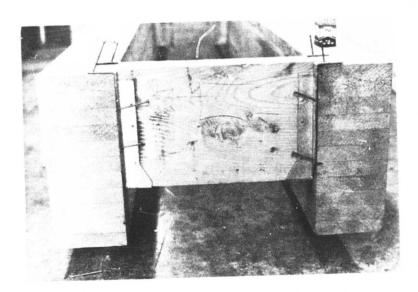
Photographs of 6-3/4" by 16-1/2" Glulam Beam Test Specimen Under Construction.
